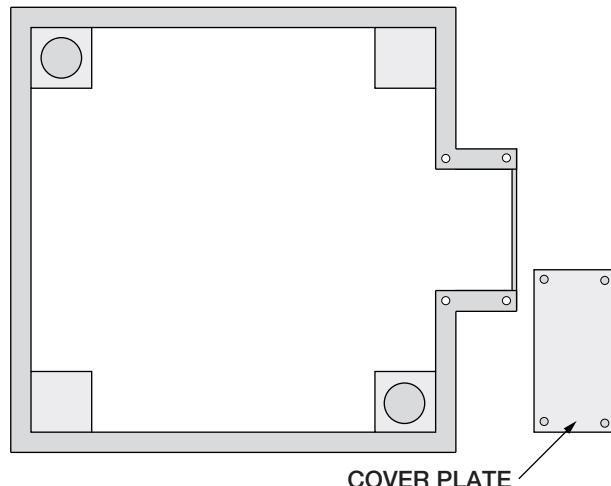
Section Showing Installed RoughDeck and Pit Frame
